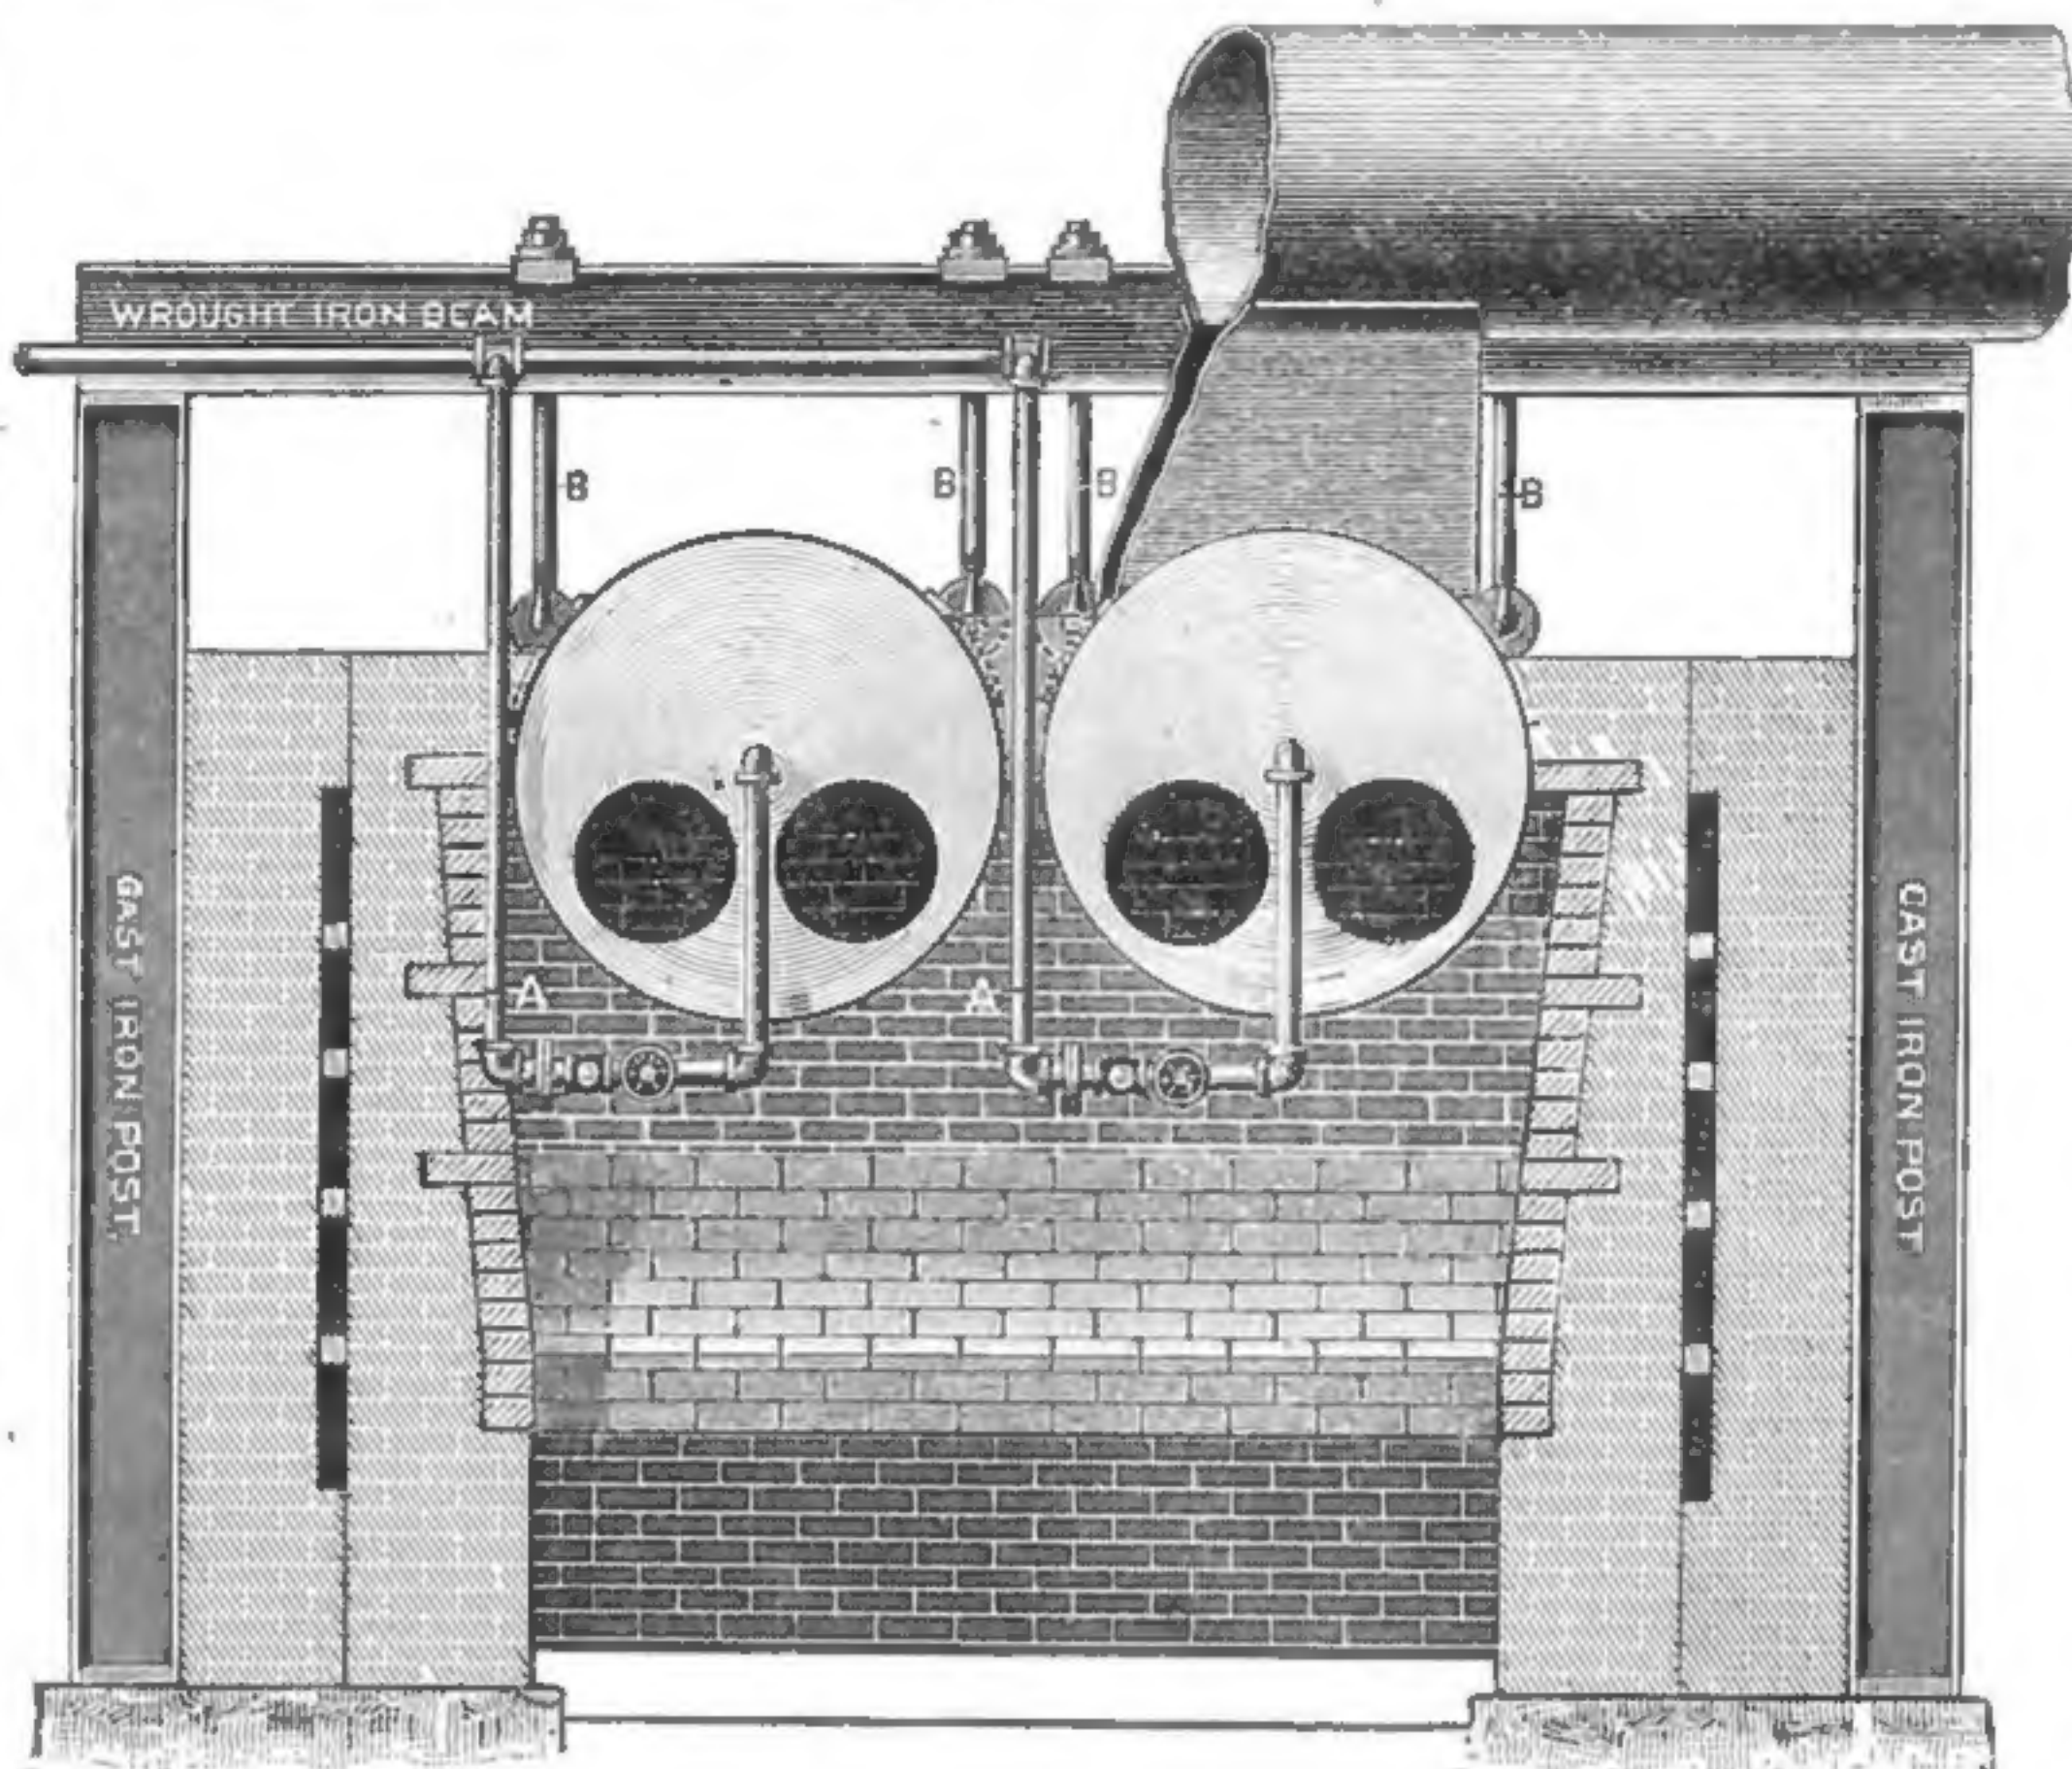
SETTING BOILERS OVER A SINGLE FURNACE.
